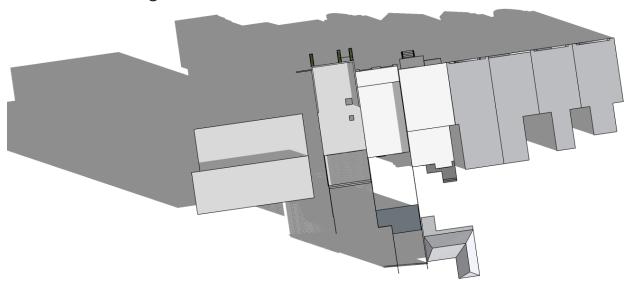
Exhibit B- The proposed design is sculpted to conform to the current pattern of development and to let light into the portion of the mid-block open space that narrows at the corner. The proposal uses tiered structure, notching, and a sloped roof form.
